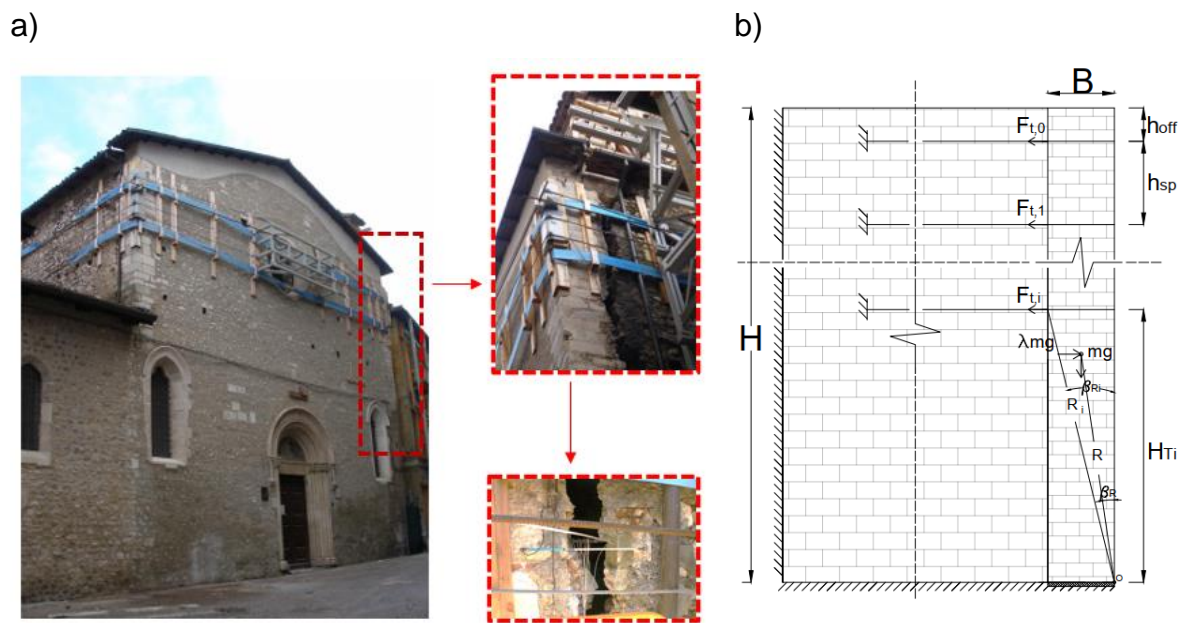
The oratory of S. Giuseppe dei Minimi in L'Aquila, Italy. a) The crack between the front wall and side walls as seen from the outside, (b) representation of the façade as restrained by three anchors
